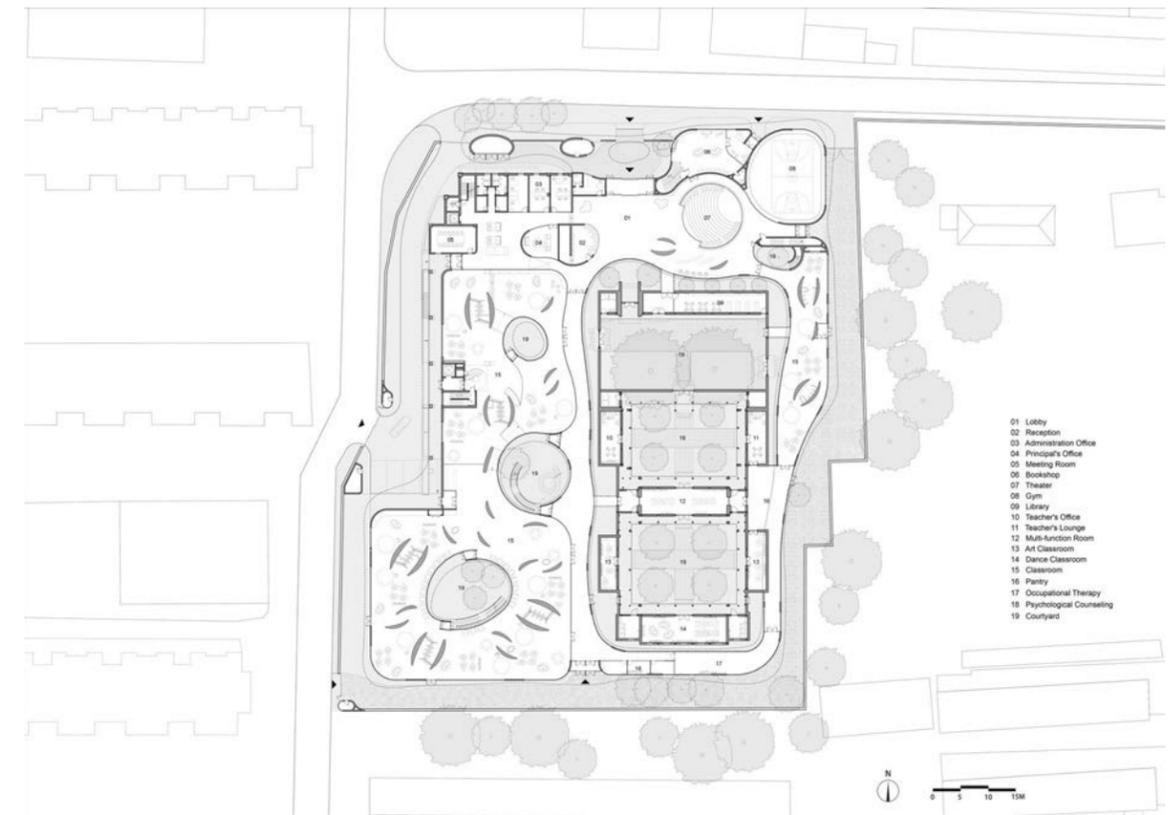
| COURTYARD KINDERGARTEN FLOOR PLAN (Ravenscroft, 2020)
